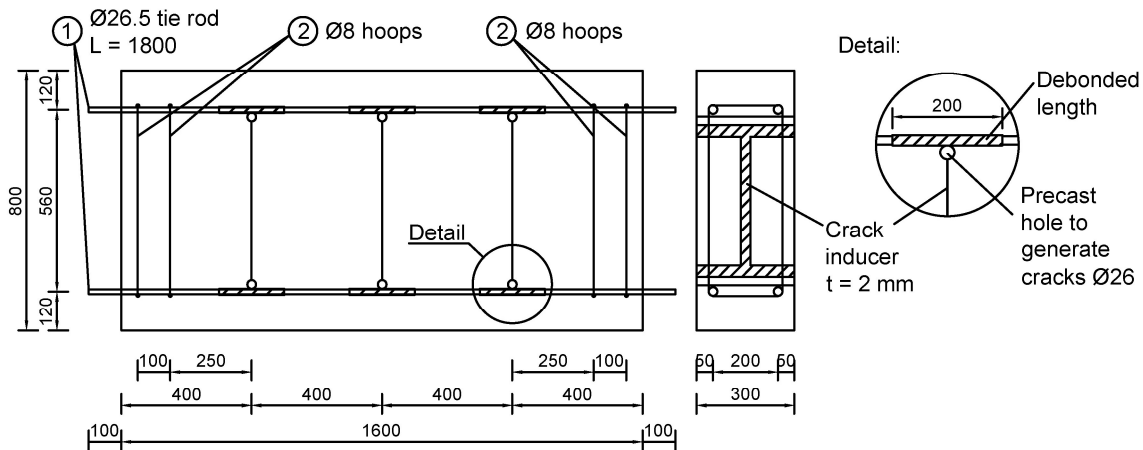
Specimen used for the tests in cracked concrete (Stehle and Sharma, 2020).
